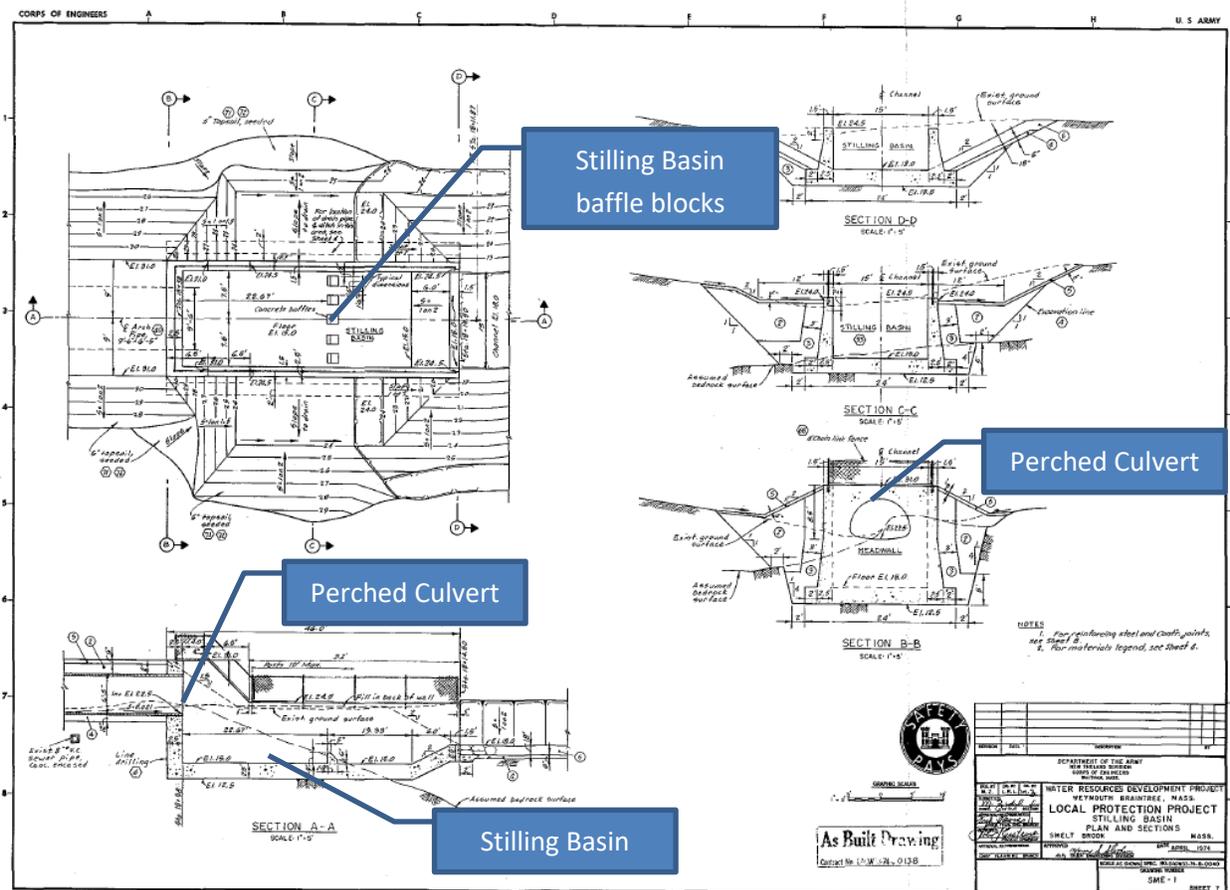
Perched Culvert / Stilling Basin with Baffle Blocks Design. Note design flaw that fails to allow upstream Fish Passage. Stilling Basin Floor elevation = 15.0 ASL, Perched Culvert = 22.5 ASL. Equivalent to 7.5 foot vertical barrier for fish passage.
